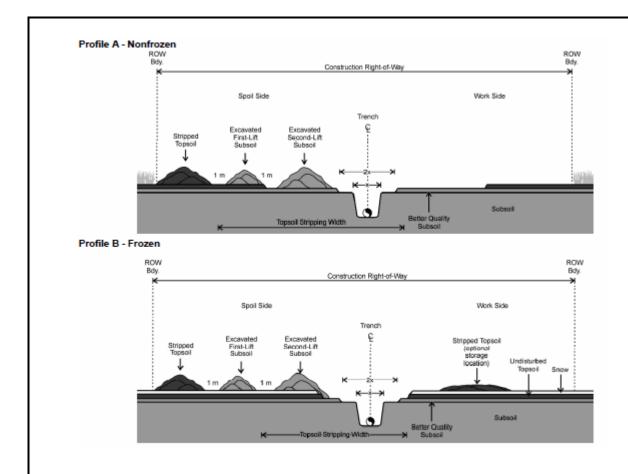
A-5 TOPSOIL SALVAGE - REDUCED SALVAGE WIDTH
